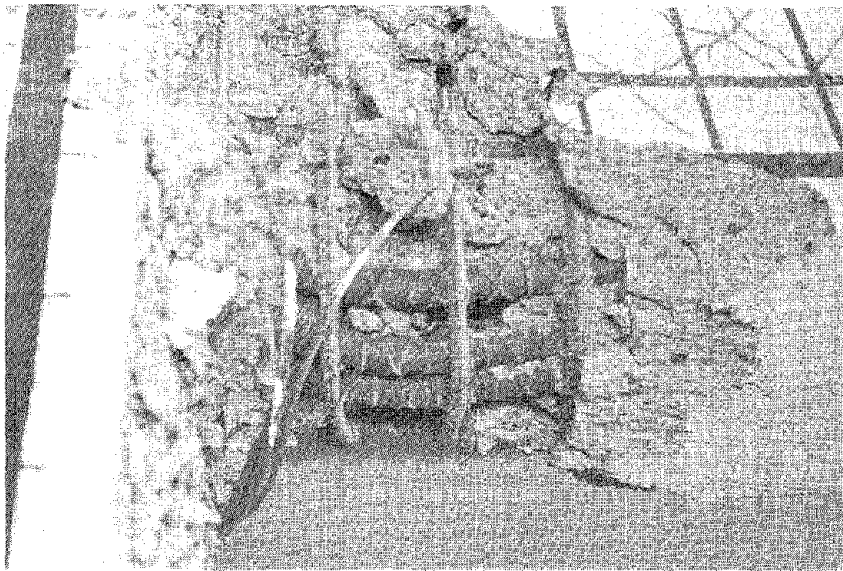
Buckled Shape of Bottom Longitudinal Reinforcement - Specimen 10.
